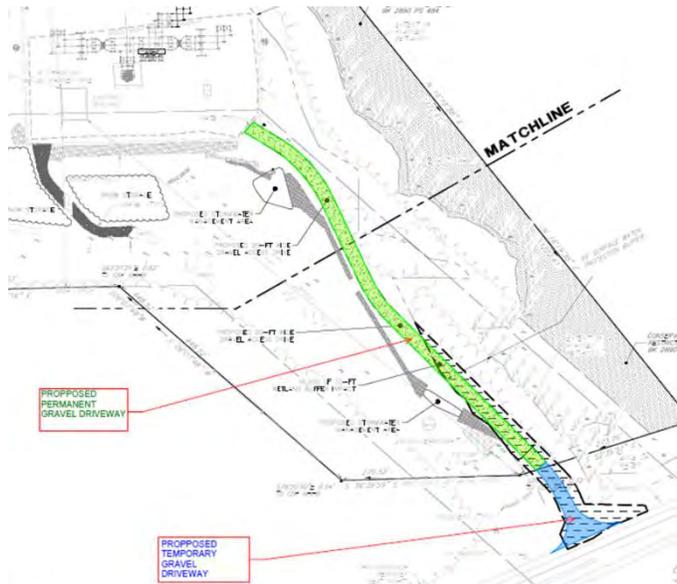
Image submitted by the Applicant to show the portion of the gravel driveway that would be temporary (shaded blue) and the portion that is proposed to be permanent (shaded in green).
